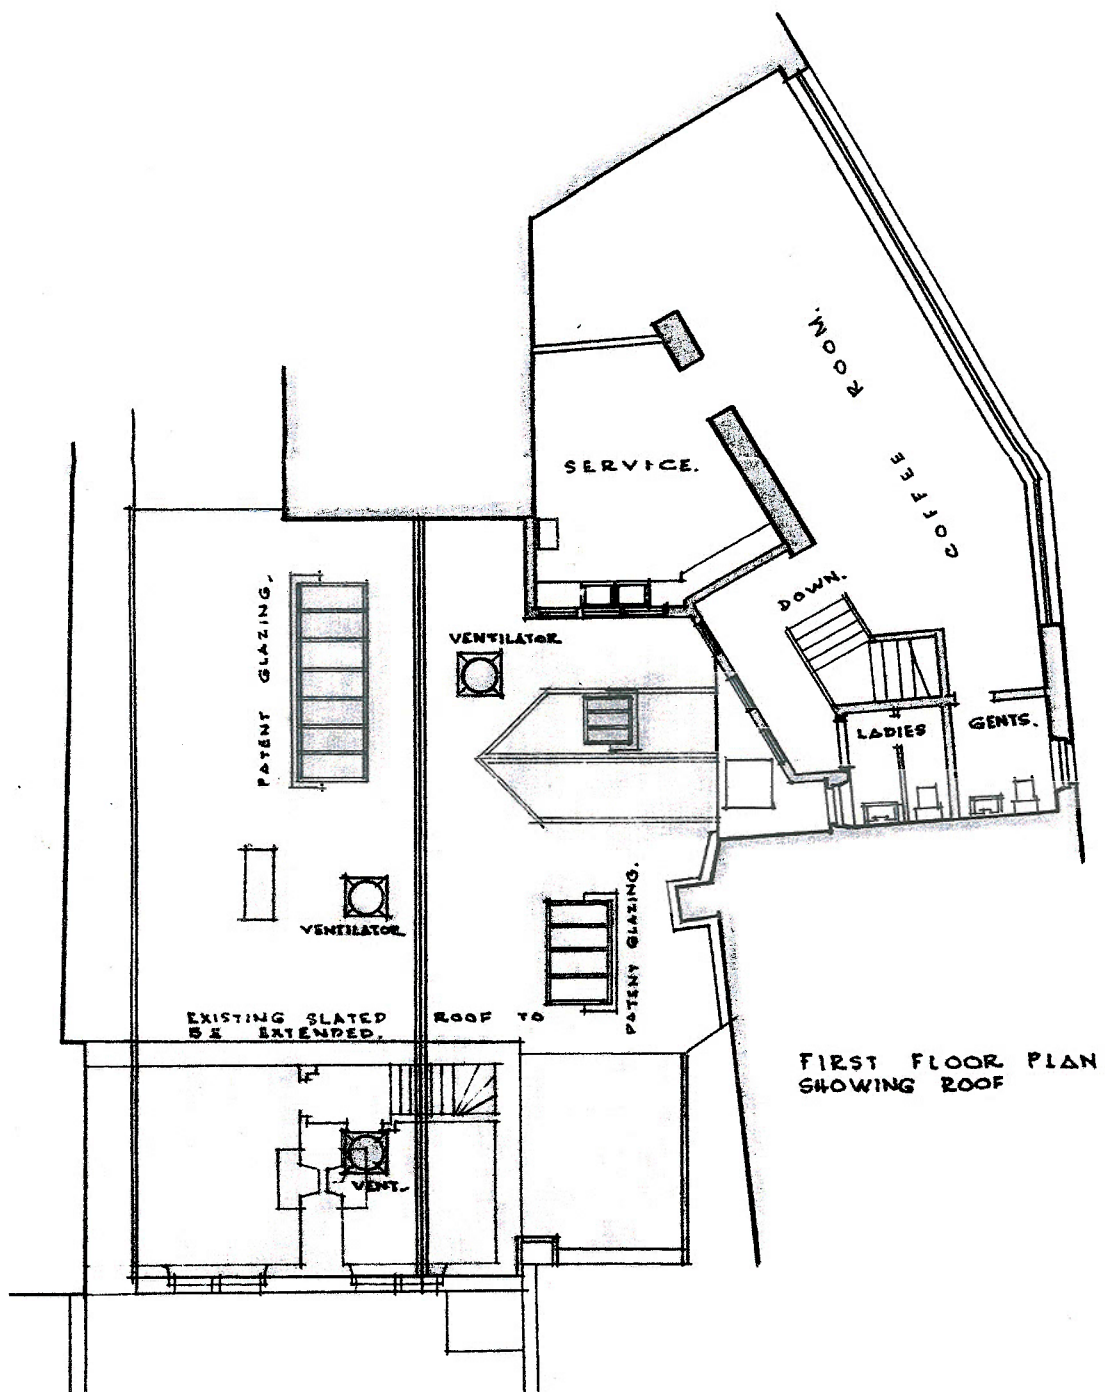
Roof Plan of Bakery 1960 scale 1/8" = 1ft.
